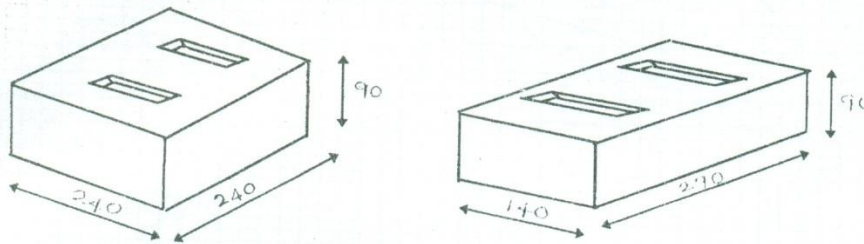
Shape of blocks manufactured by using Aurum Press 3000 machine
